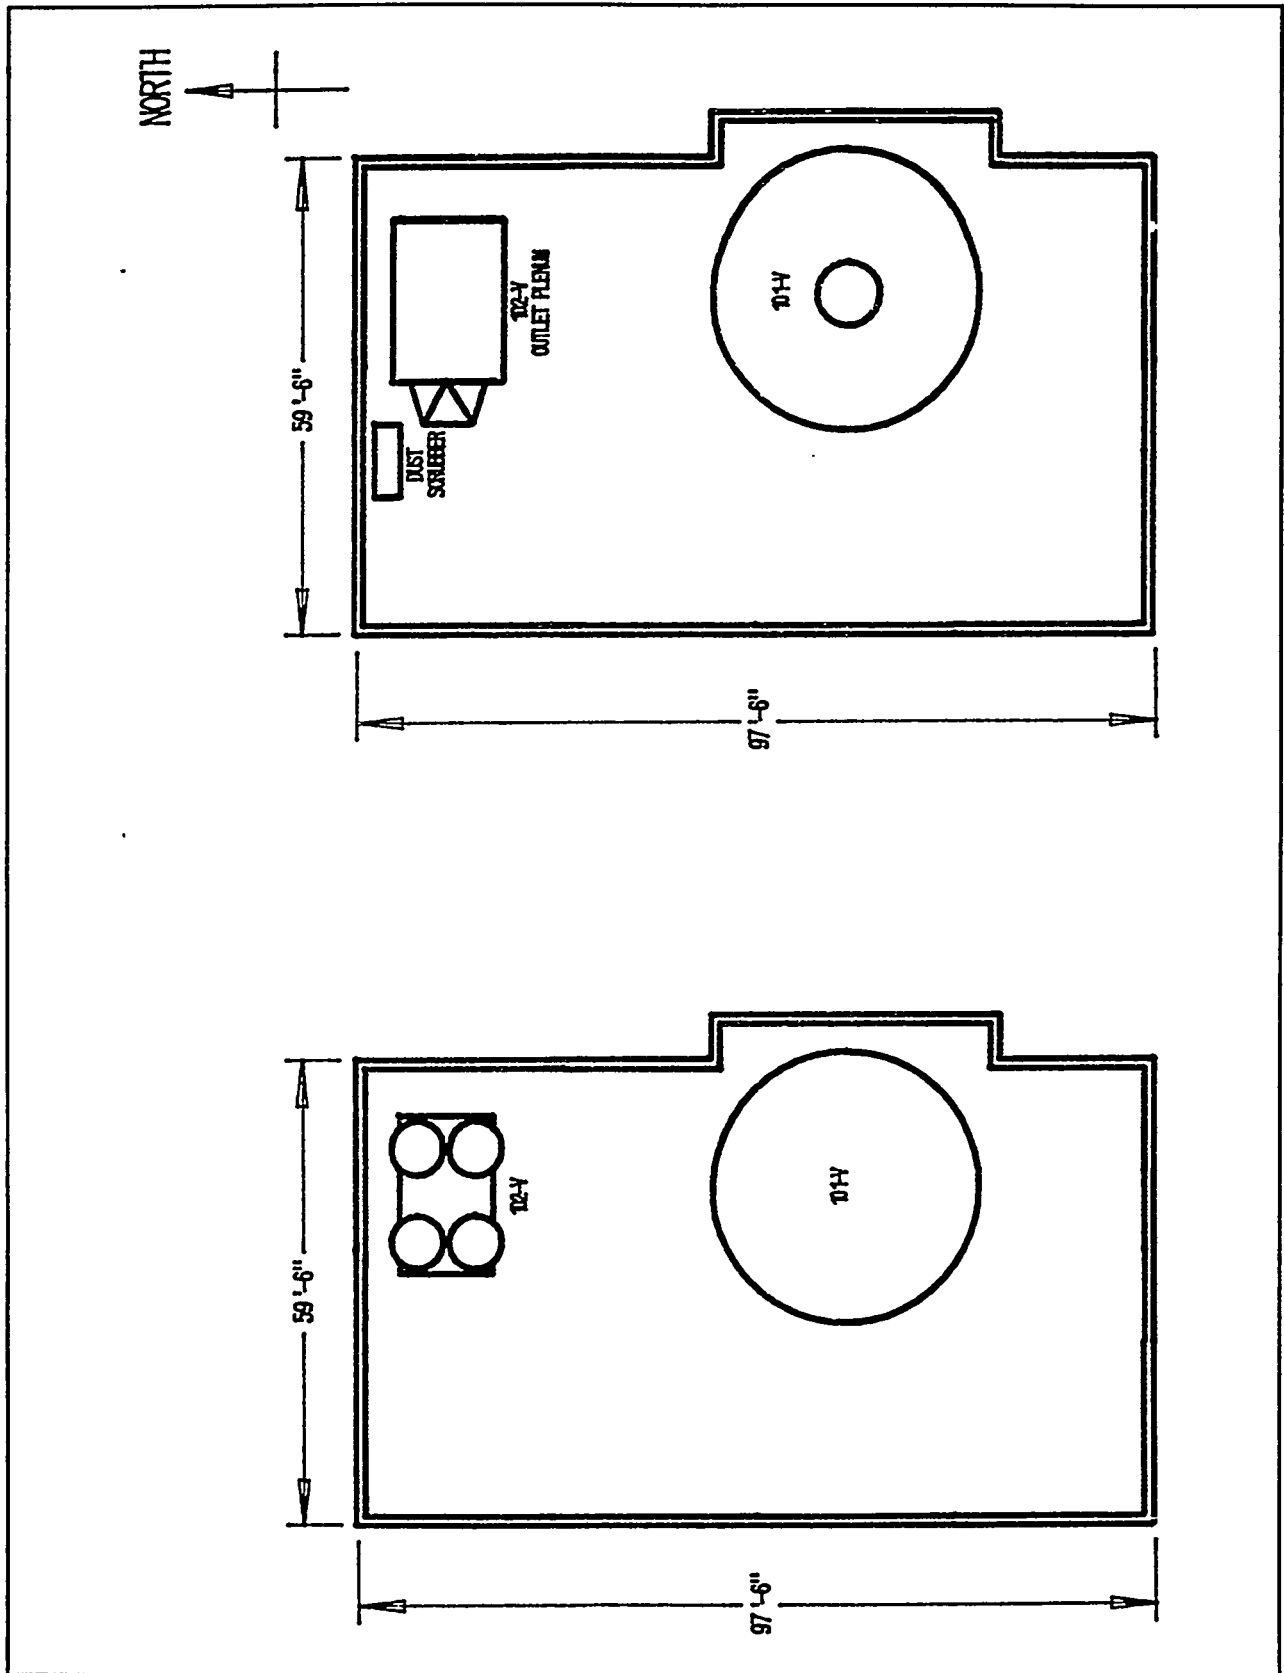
PDF Structure Floor Plan (Elevations 225'-6" and 235'-6")
